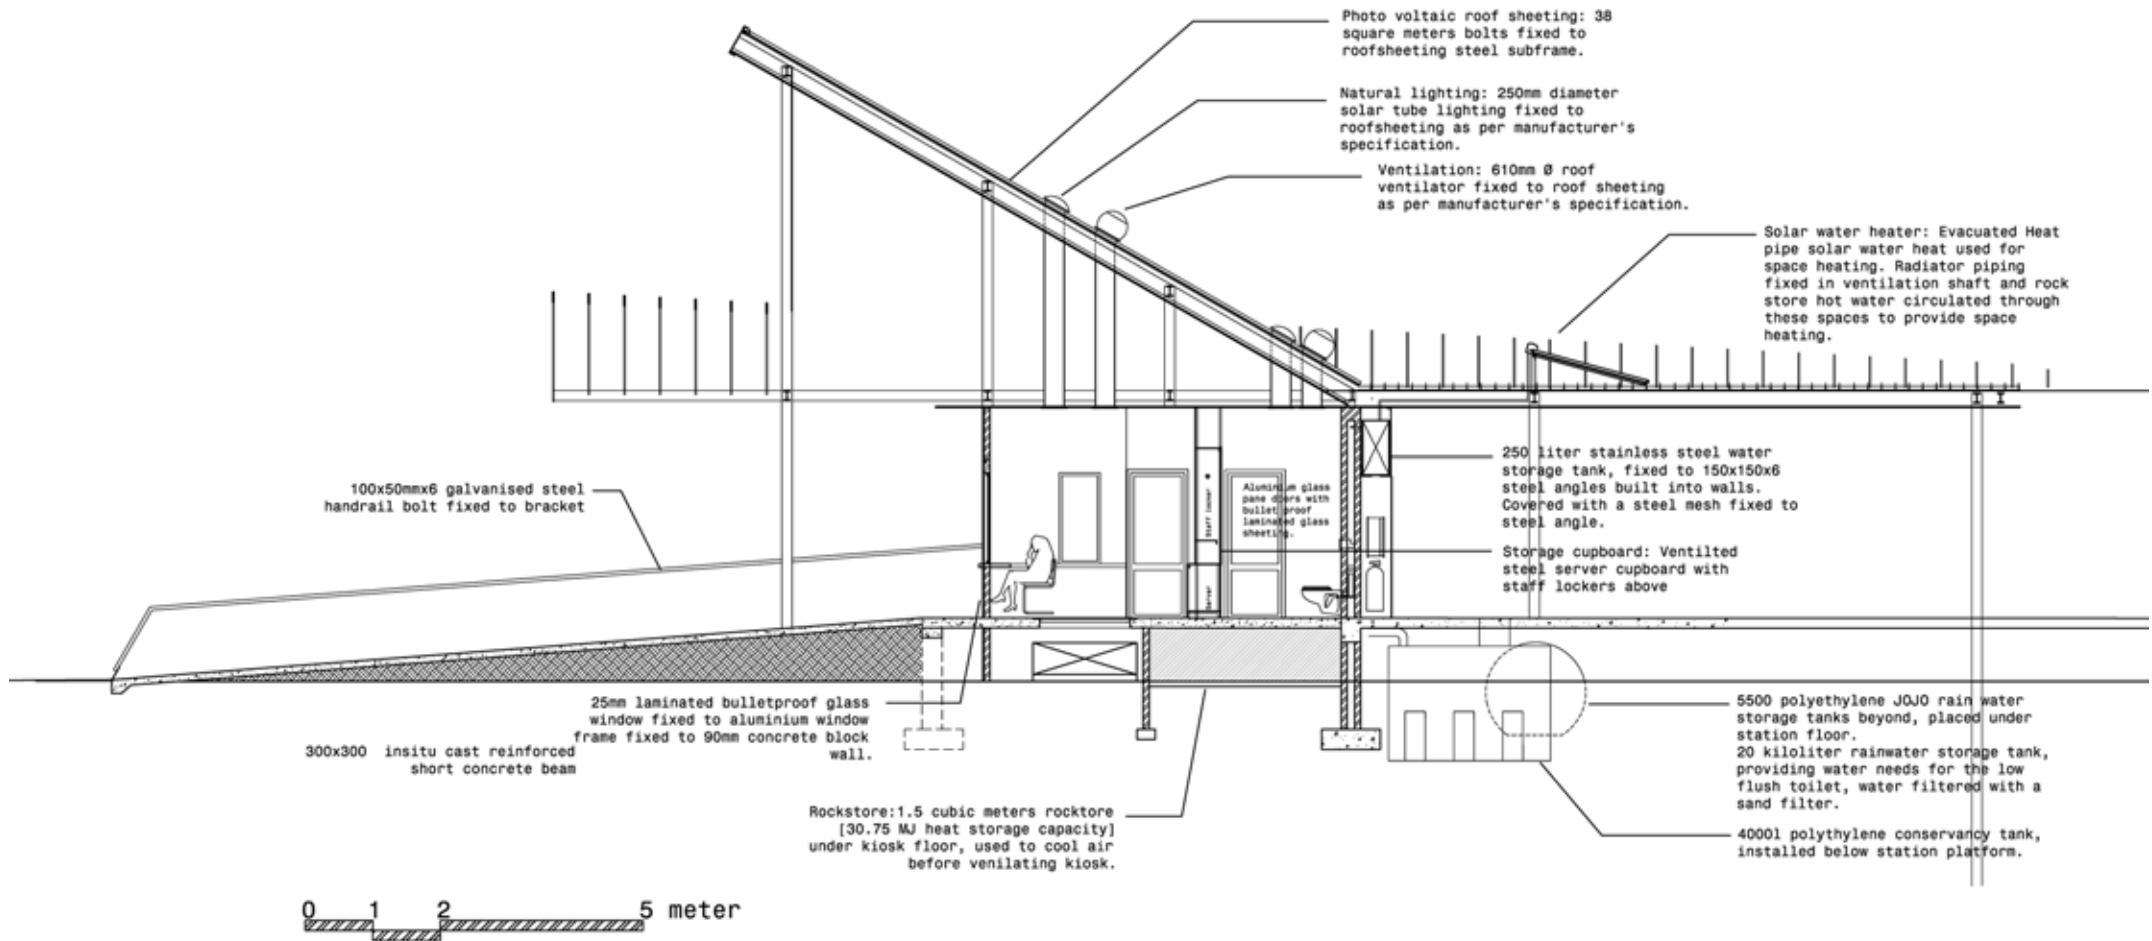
Elevation [B] of the BRT station [Source: Author]
